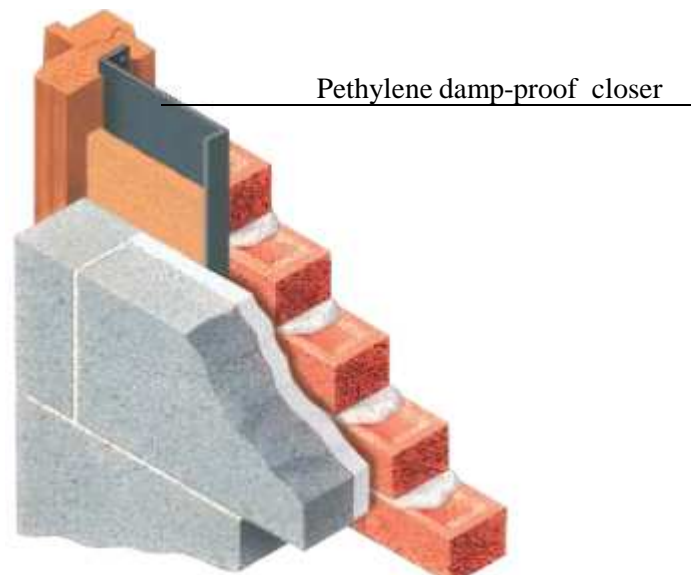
Pethylene damp-proof closer also preventing thermal bridging in the interface between the wall (insulated in the cavity, with the insulation leaning on the internal leaf) and the opening through the overlap of insulation boards (CT, 2011)
